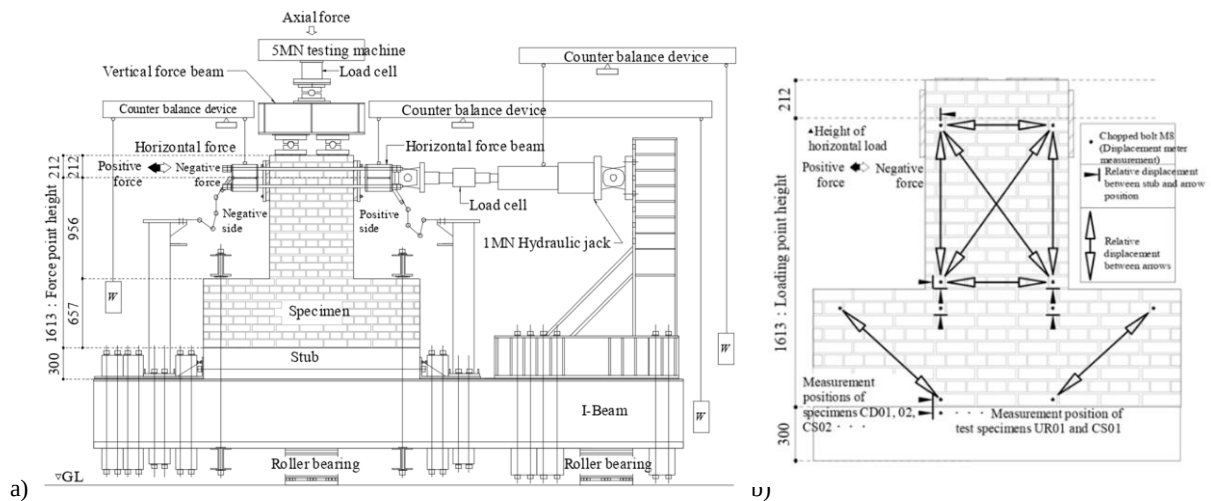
a) Horizontal loading test setup b) Position of transducers on the specimen
